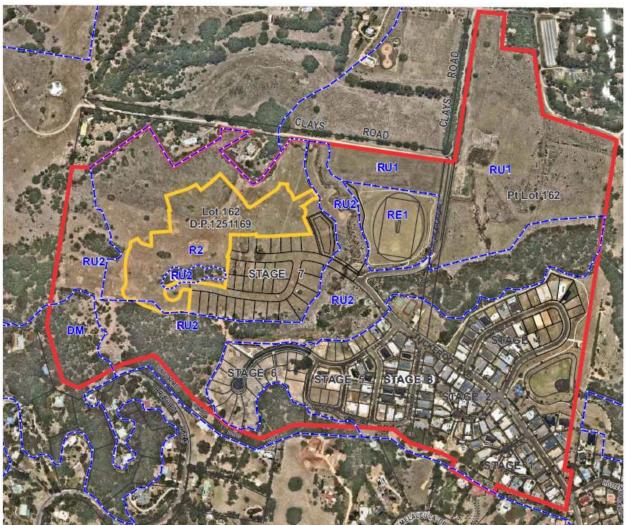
Site Plan (Stage 8 highlighted in Yellow)
